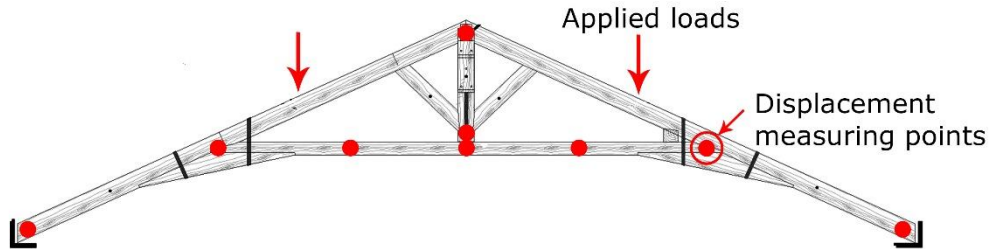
Testing layout of the Chimico Laboratory roof truss (after [12])
